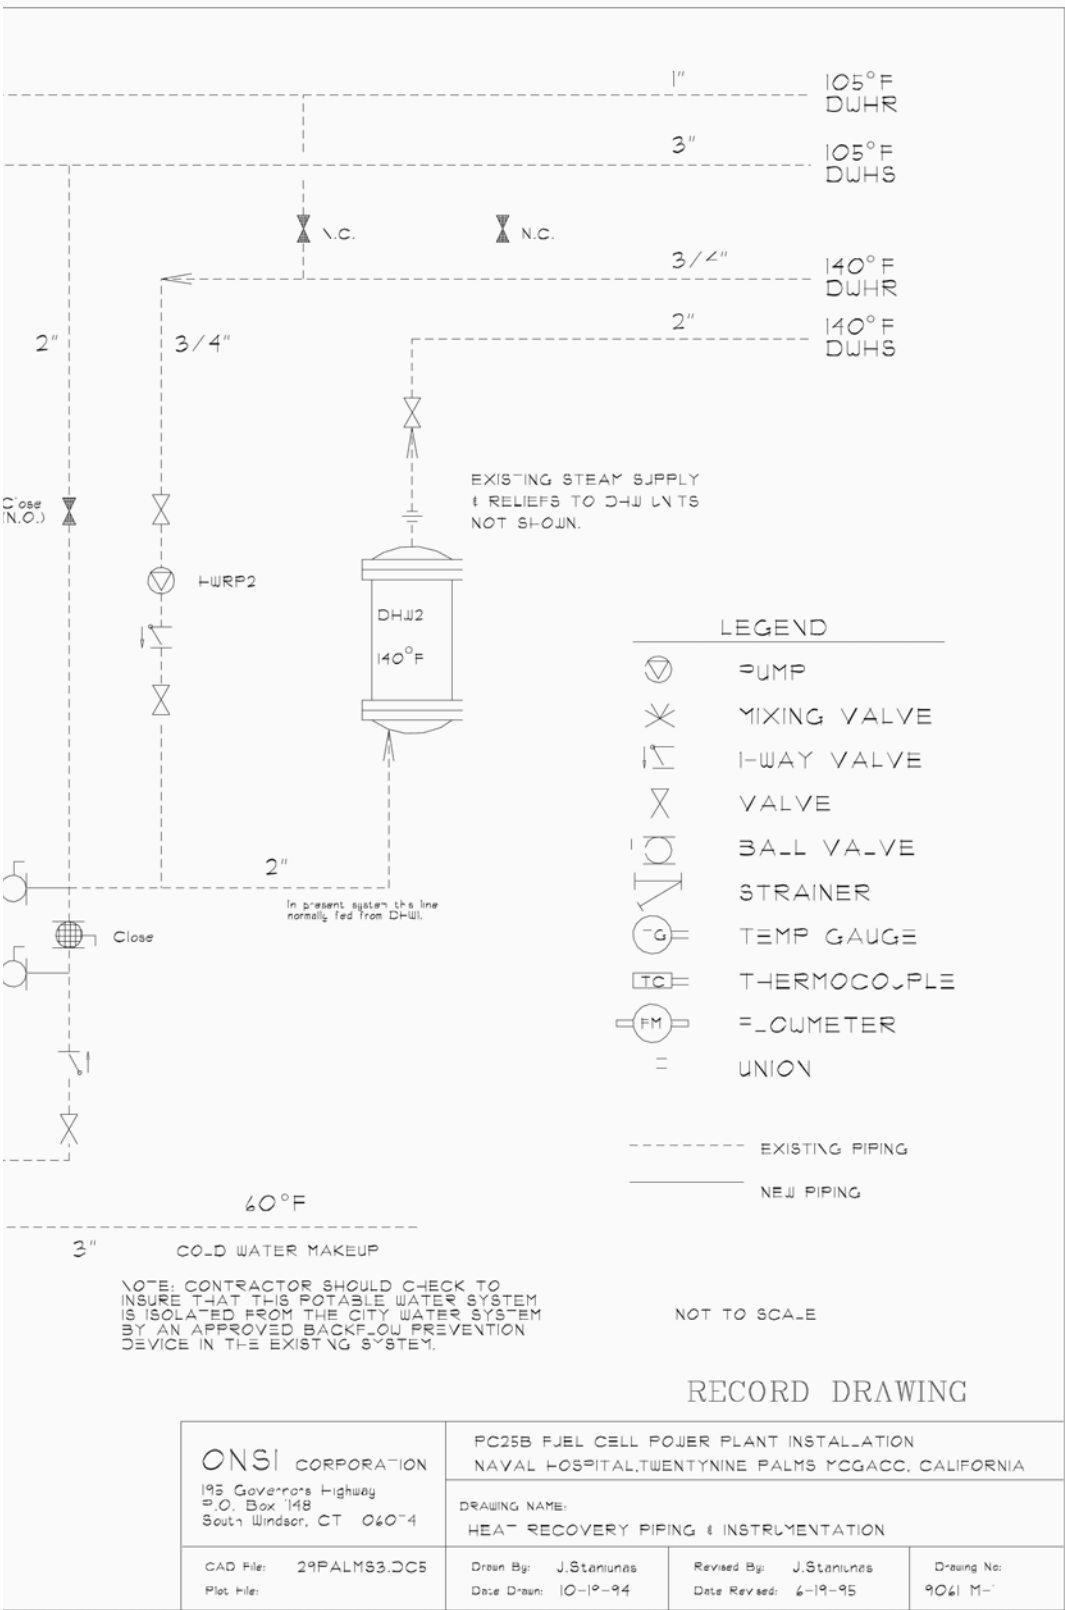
Final installation drawing – heat recovery piping and instrumentation.
